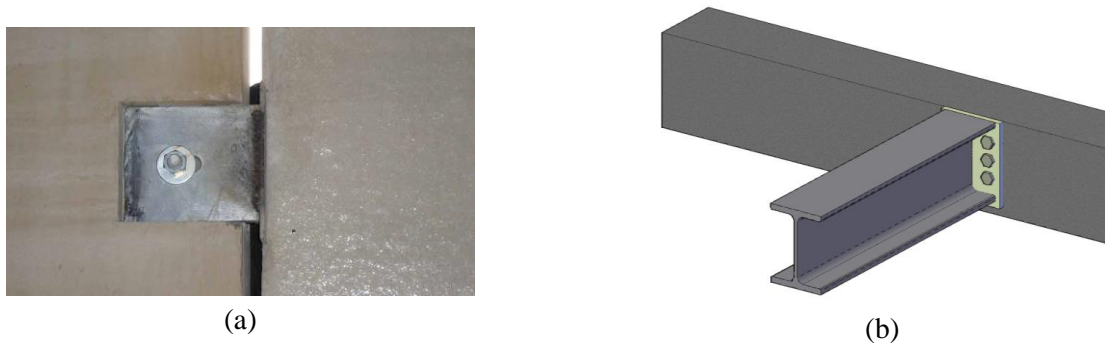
(a) Shear loaded connection between precast concrete wall panels (picture from (*National Precast Concrete Association, 2012*)); (b) connection for fastening a steel beam to a concrete beam.
